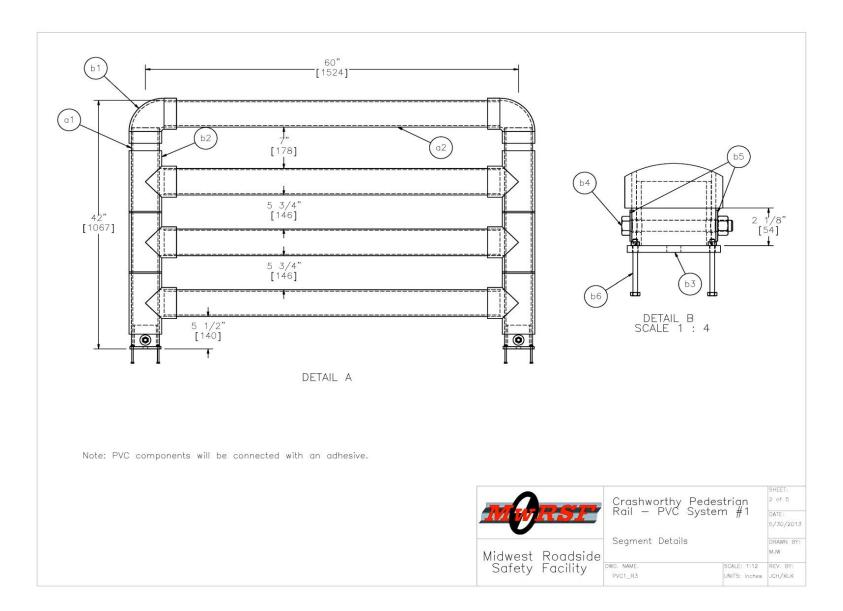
Modular PVC Rail, Design Concept PVC1 (Sheet 2 of 5)
